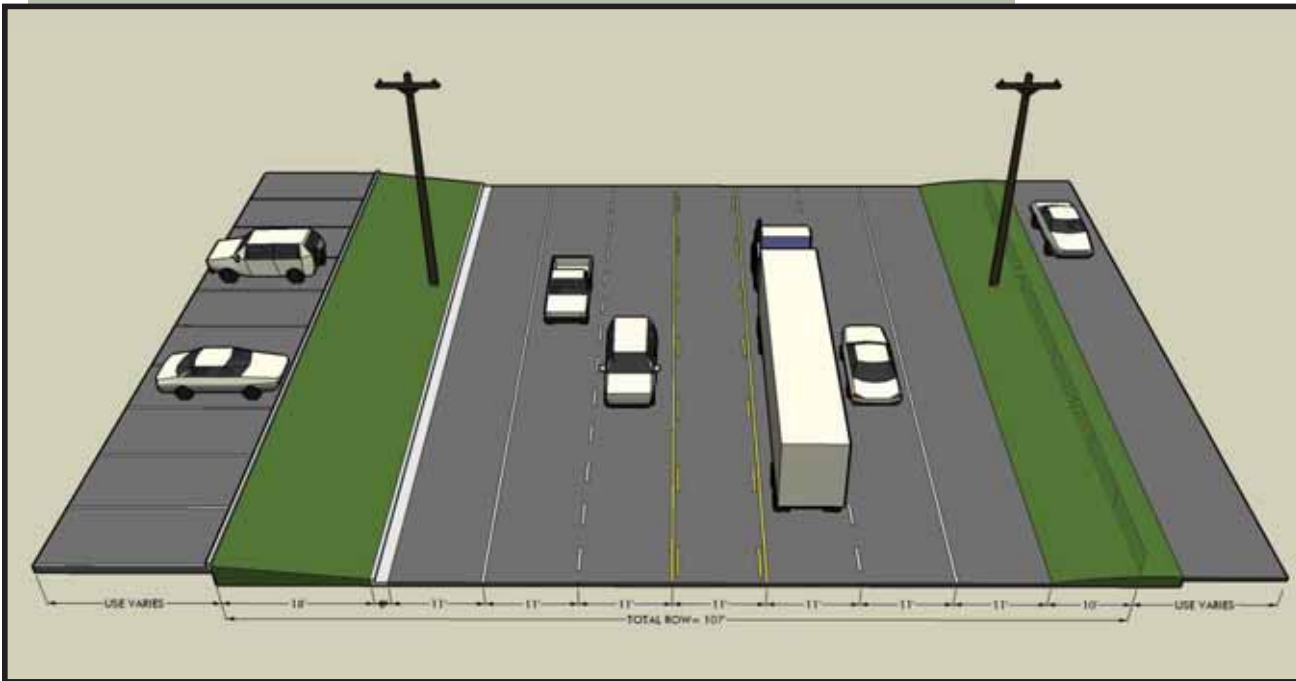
Knox Road to Cedar Road — Long-Term Vision
